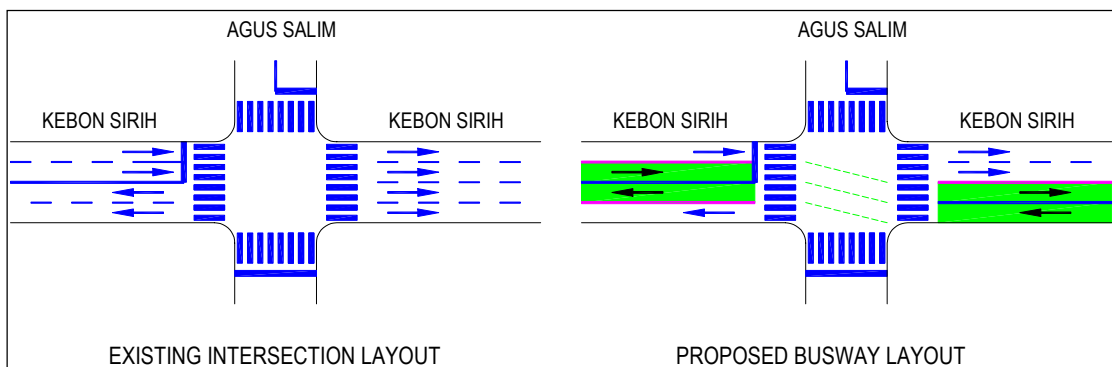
Intersection Layout at Kebon Sirih – Agus Salim Intersection
